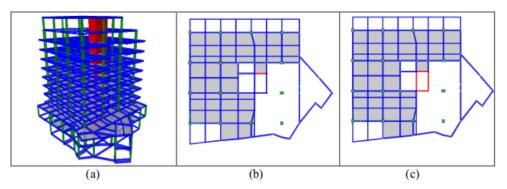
Hotel building model: (a) 3 d image (b) shearwall one sided X direction (c) shear wall two sided X and two sided Y direction.
